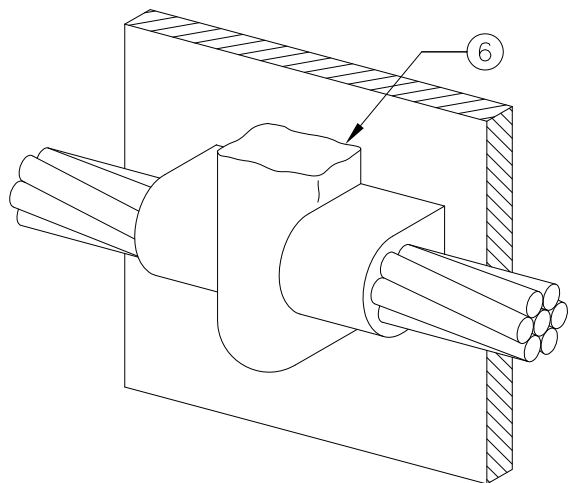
C – HORIZONTAL THROUGH WIRE TO A HORIZONTAL STEEL SURFACE. WIRE ON THE SURFACE.
